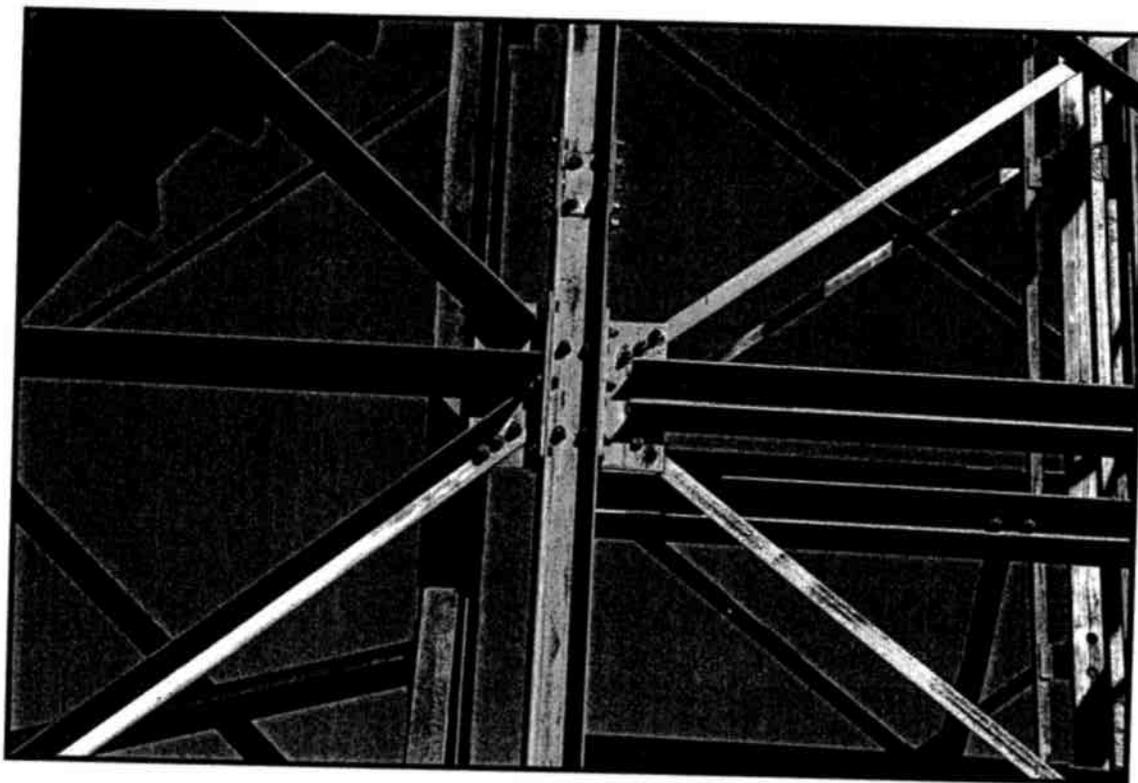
View of typical bolted connection of struts and bracing members to headframe leg (Source: George Weaver, 2005. No copyright restrictions).
